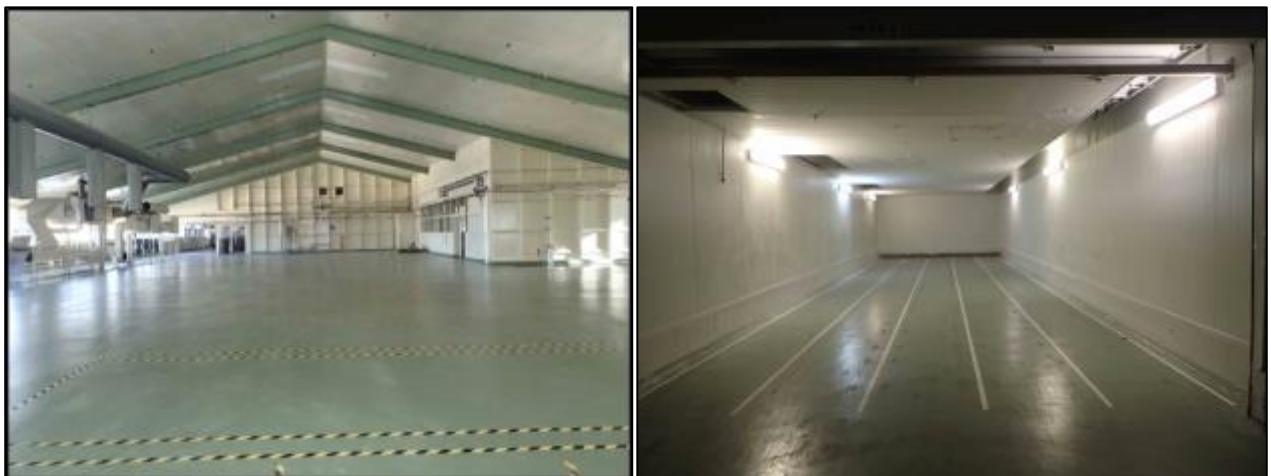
Photograph looking west at factory space (Block 5C) on the fourth floor (left) and photograph of drying room in the biscuit and dispatch building (Block 4C) looking west on the ground floor.
